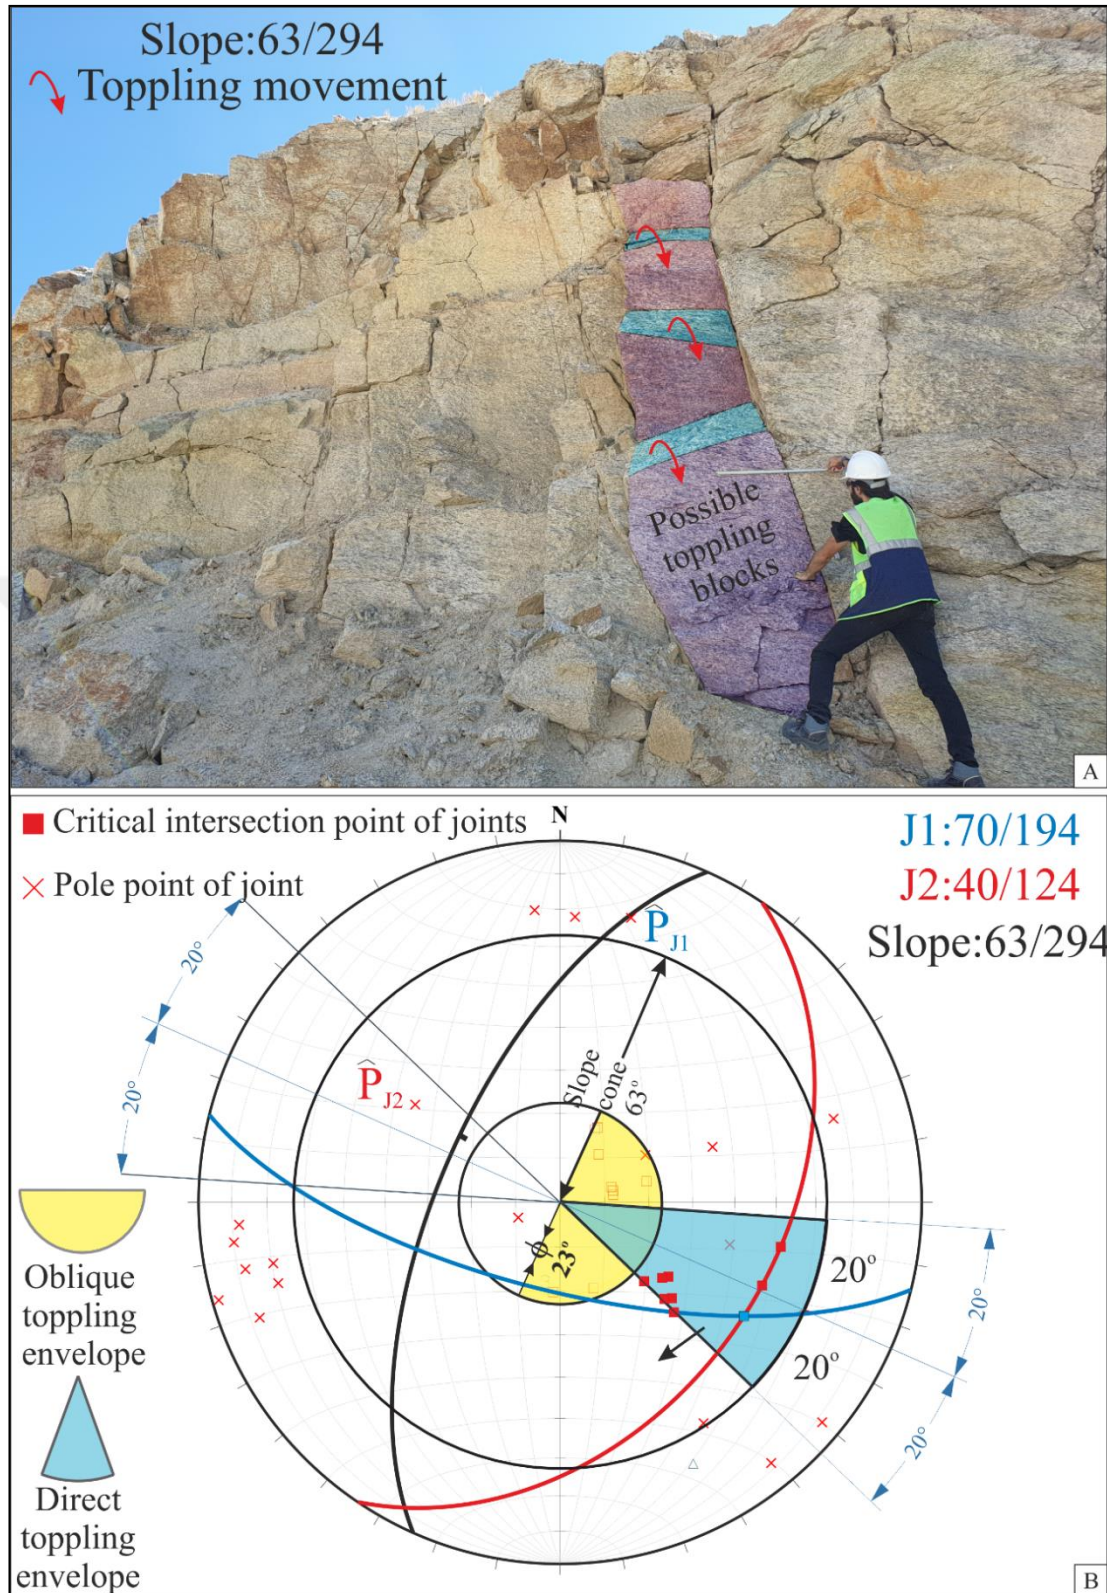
Direct toppling type failure; (a) Blocks formed by sets of joints perpendicular to each other, (b) Kinematic analysis of direct (block) toppling type failure
